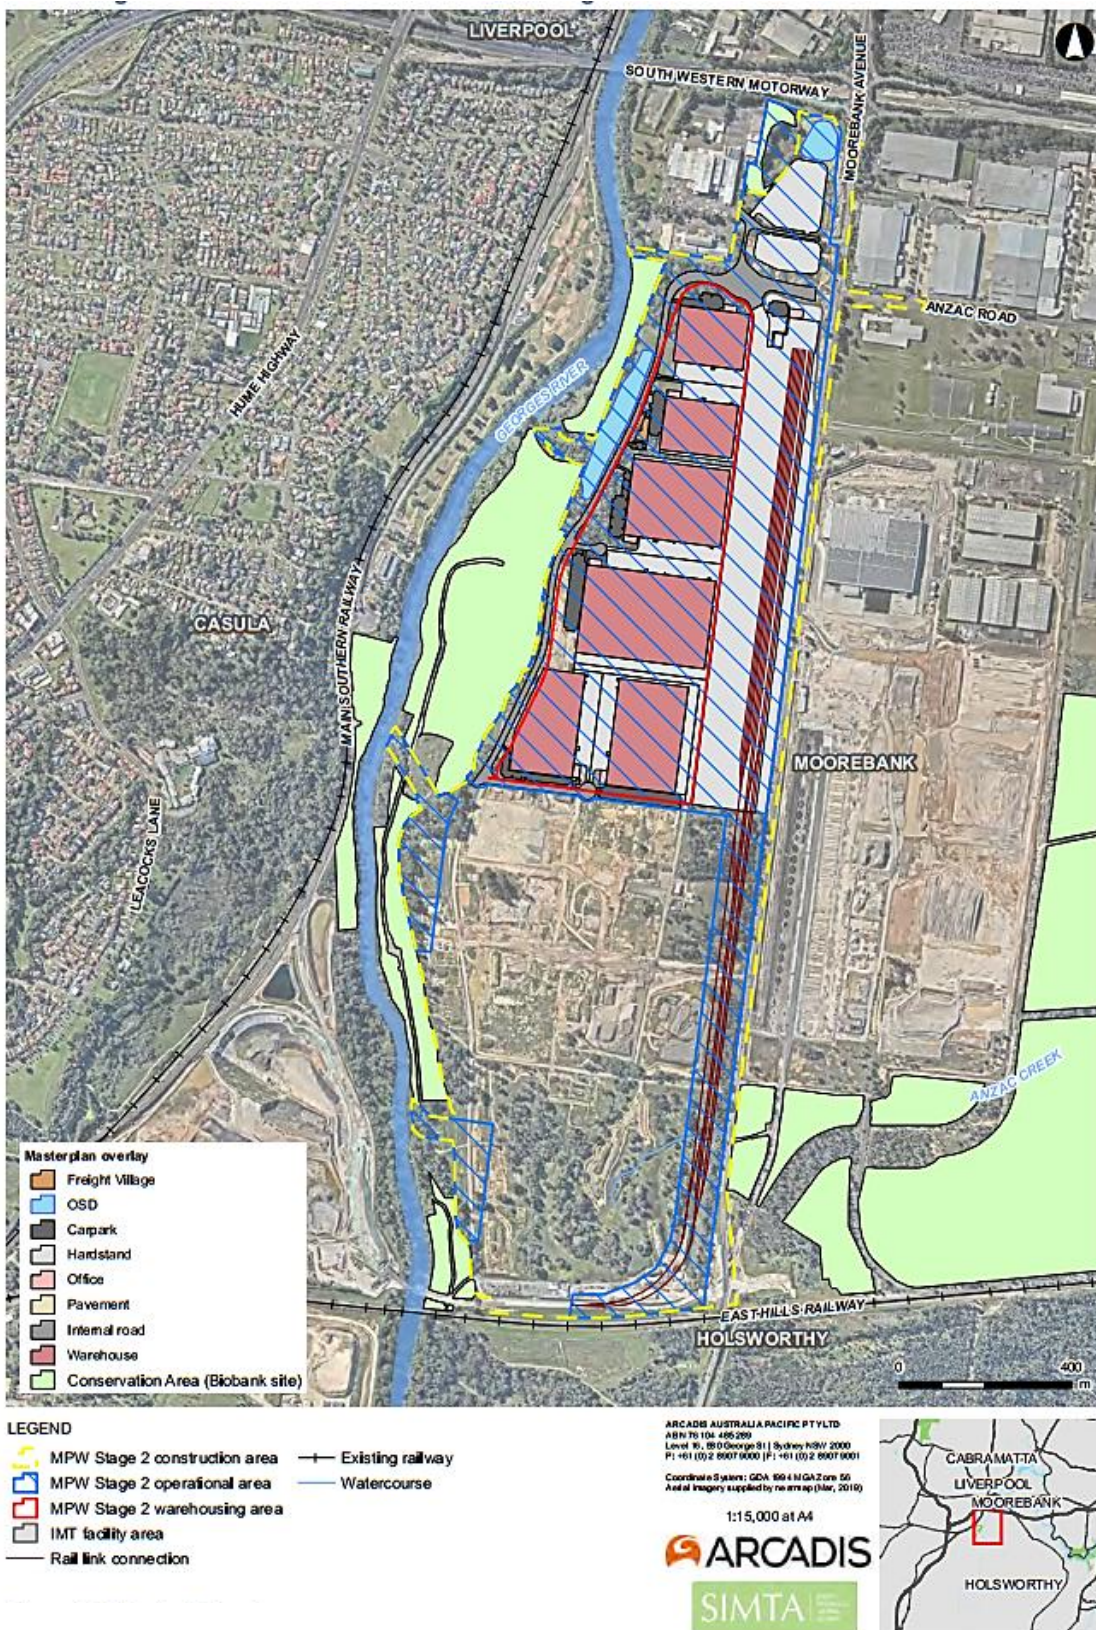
The Project (Source: Construction Environmental Management Plan, Moorebank Precinct West Stage 2, SIMTA, 14 January 2020)
